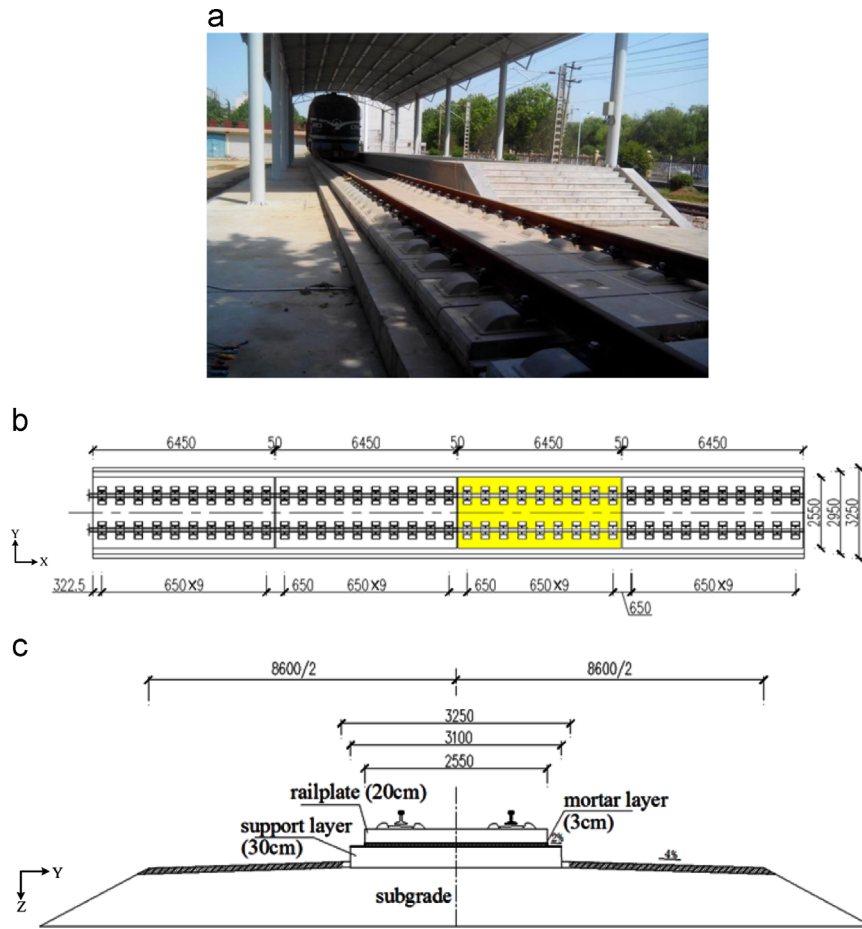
Overview of model: (a) photograph of site model, (b) plane view, and (c) cross section.
